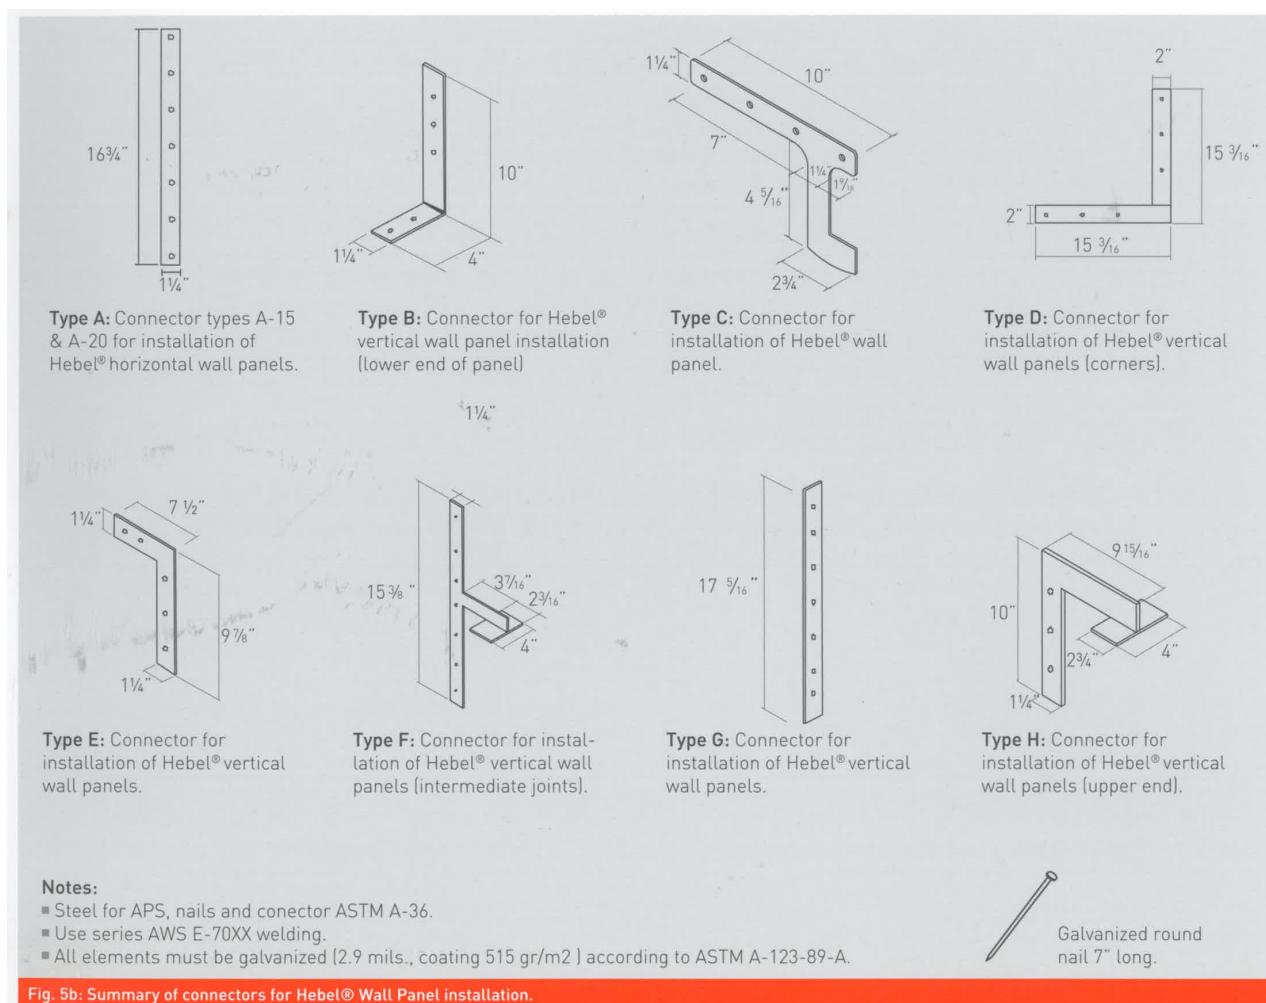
Summary of connectors for Hebel® Wall Panel installation.
